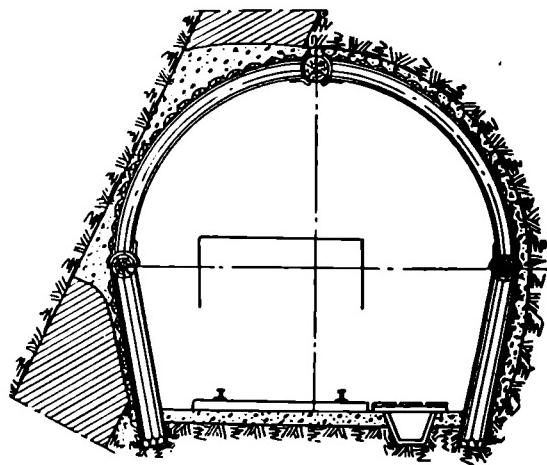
Entry in a steep seam with a composite joint-shaped arch support
